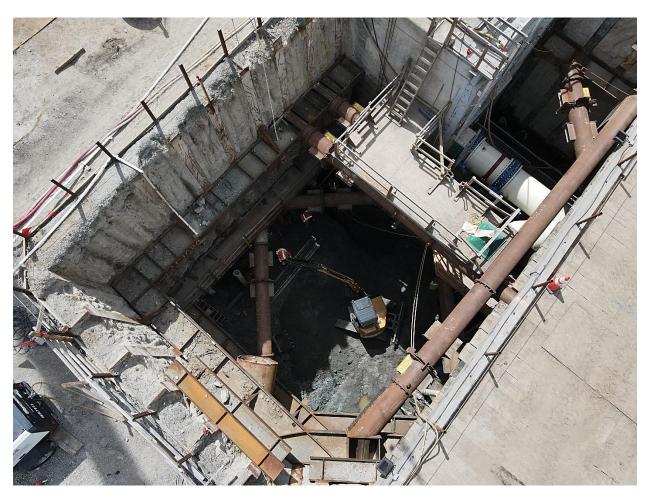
Excavation 40-feet below ground surface in the Effluent 1 excavation pit in preparation for the 90-inch Effluent 2 tunnel. This pit is partially covered by the temporary construction bridge shown in the lower right-hand corner of the photo. The pit will have four piping tunnels and will serve as the key hydraulic connection point for connecting the existing filter plant to the new UV-CCB Facility.
